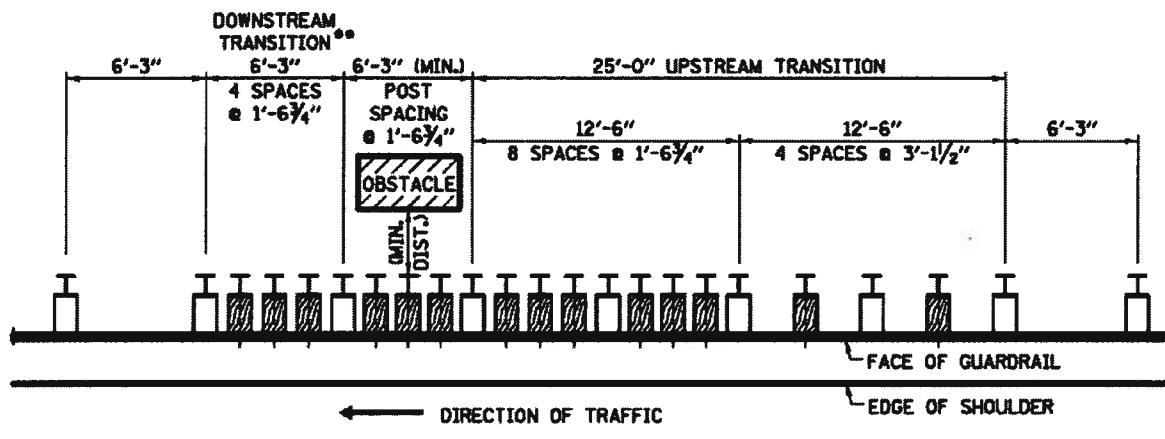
Guardrail Post Spacing Transition to 1/2-Post Spacing
